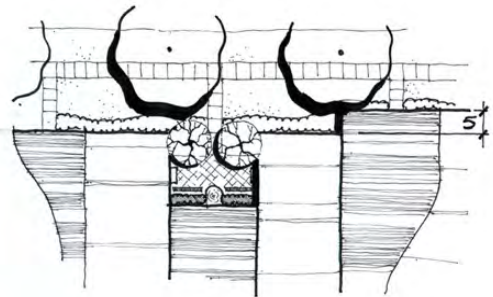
Adjacent buildings, whether separated or connected by common walls, should not differ in front setback by more than 5 feet except for the purposes of forming a courtyard.
